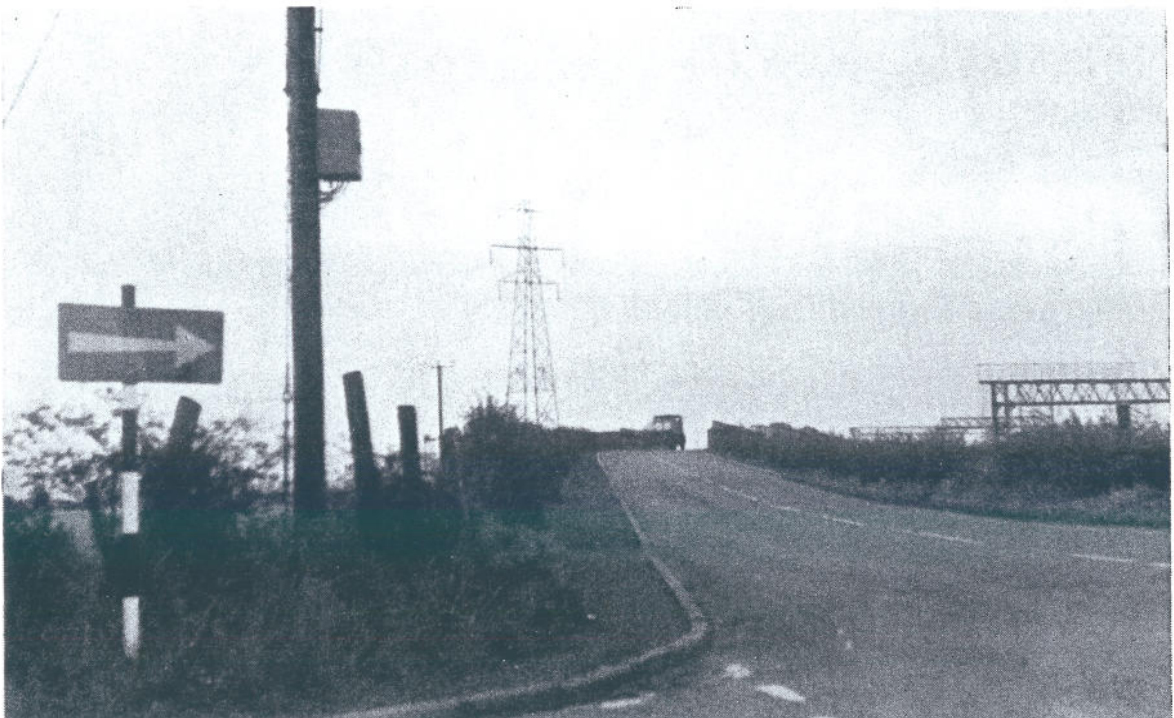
Liverpool-Widnes Road A562 view looking east towards Butchers Railway Bridge which has a 19 feet wide carriageway only and restricted visibility.
